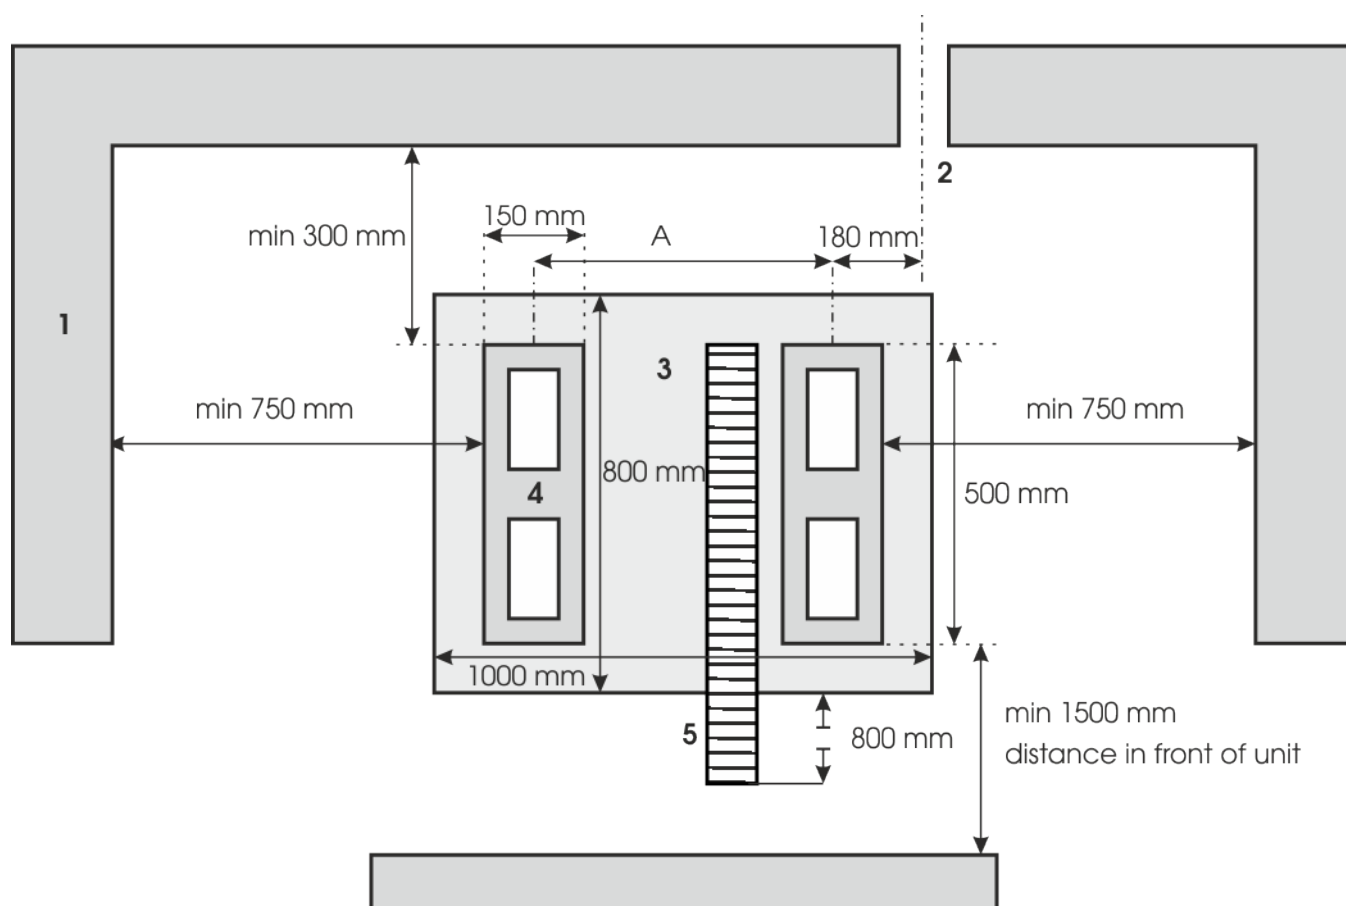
Drawing of foundation for the outdoor unit - floor plan
